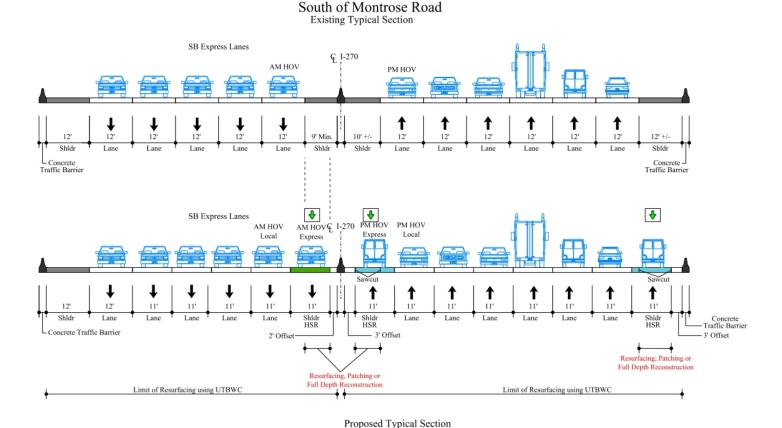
PTC 1 and 10 Typical Section - South of Montrose Road Resurfacing, Patching or Full Depth Reconstruction Sections
